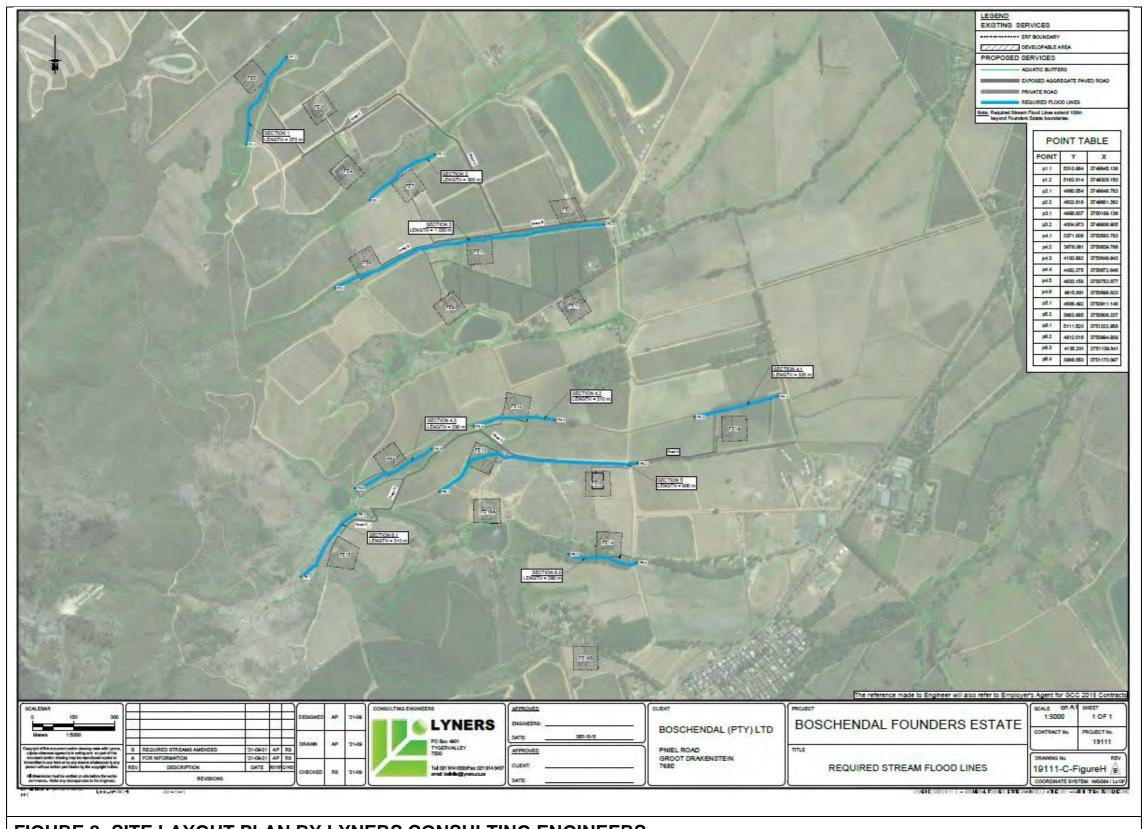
SITE LAYOUT PLAN BY LYNERS CONSULTING ENGINEERS
